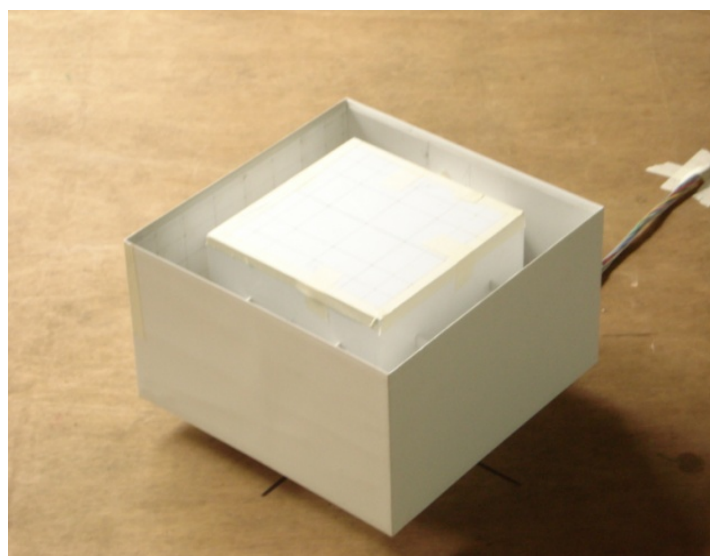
Scaled cubical SEB surrounded by an elevated sheet clad scaffold
